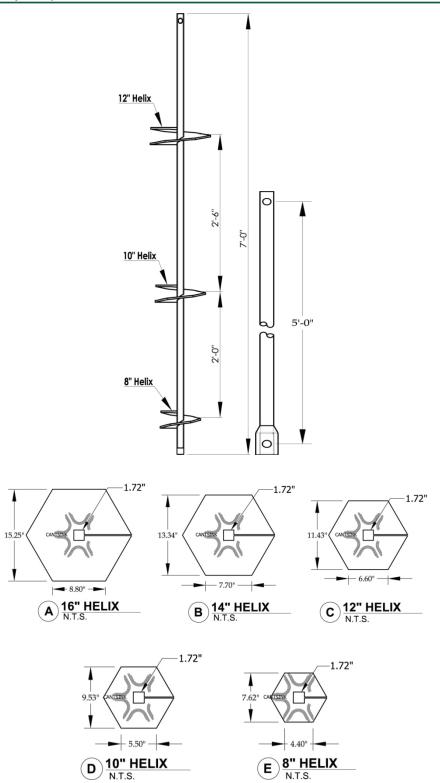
1.5-INCH SQUARE SHAFT HELICAL PILE LEAD SECTION, EXTENSION SECTION AND HELICAL PLATES (TYPICAL)
